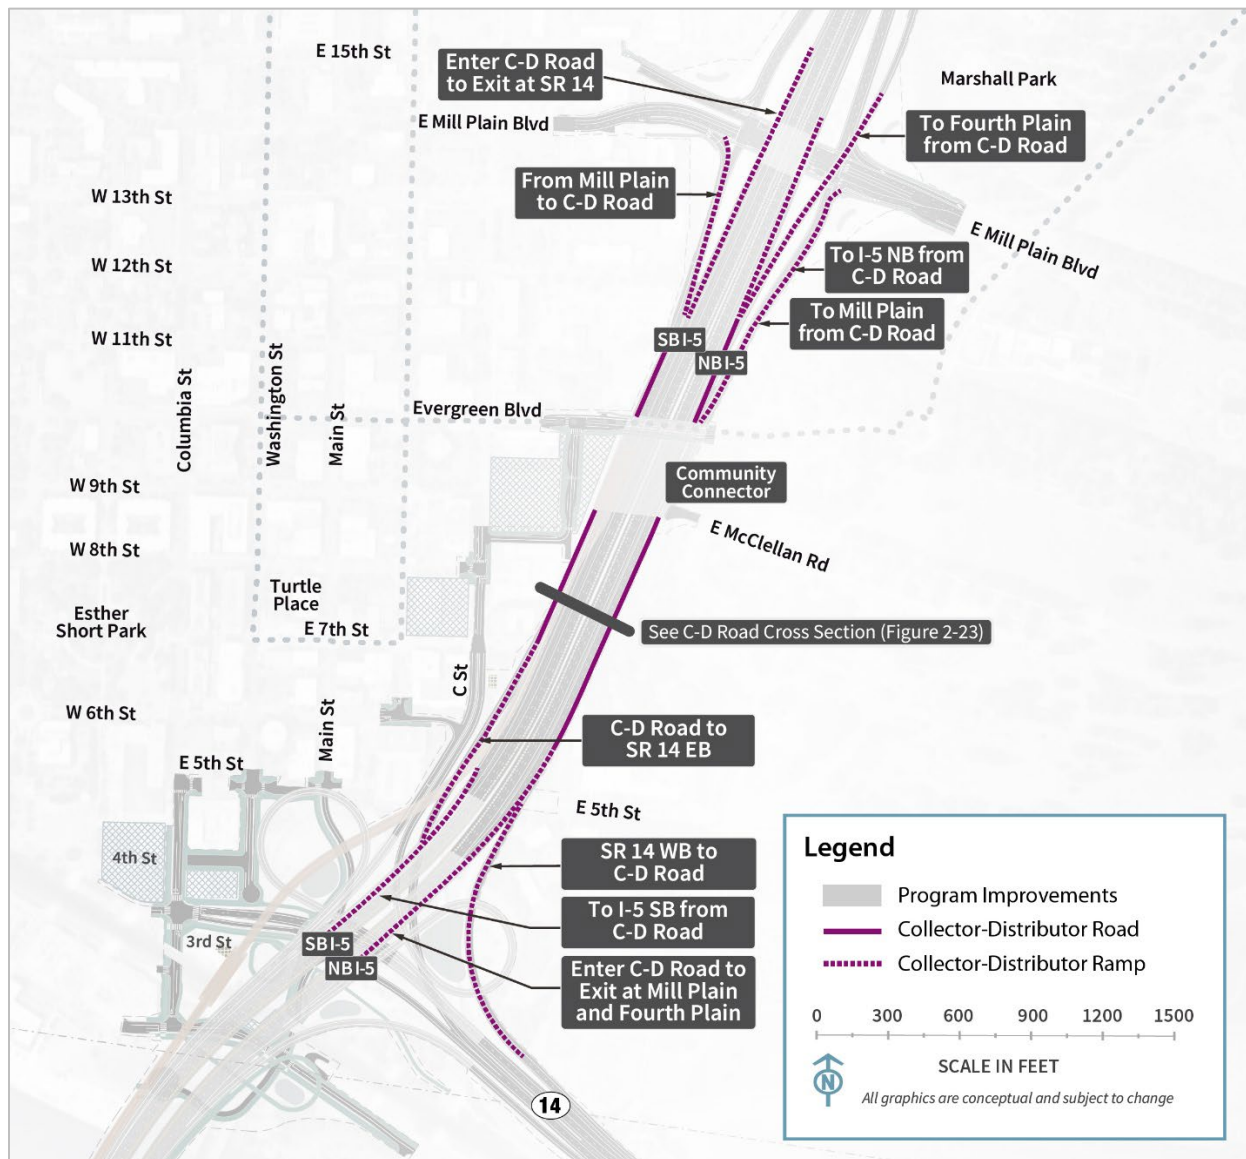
shows the location of the collector-distributor (C-D)¹¹ roadways in downtown Vancouver, and Figure 1-26 shows a typical cross section of the C-D roadways.
